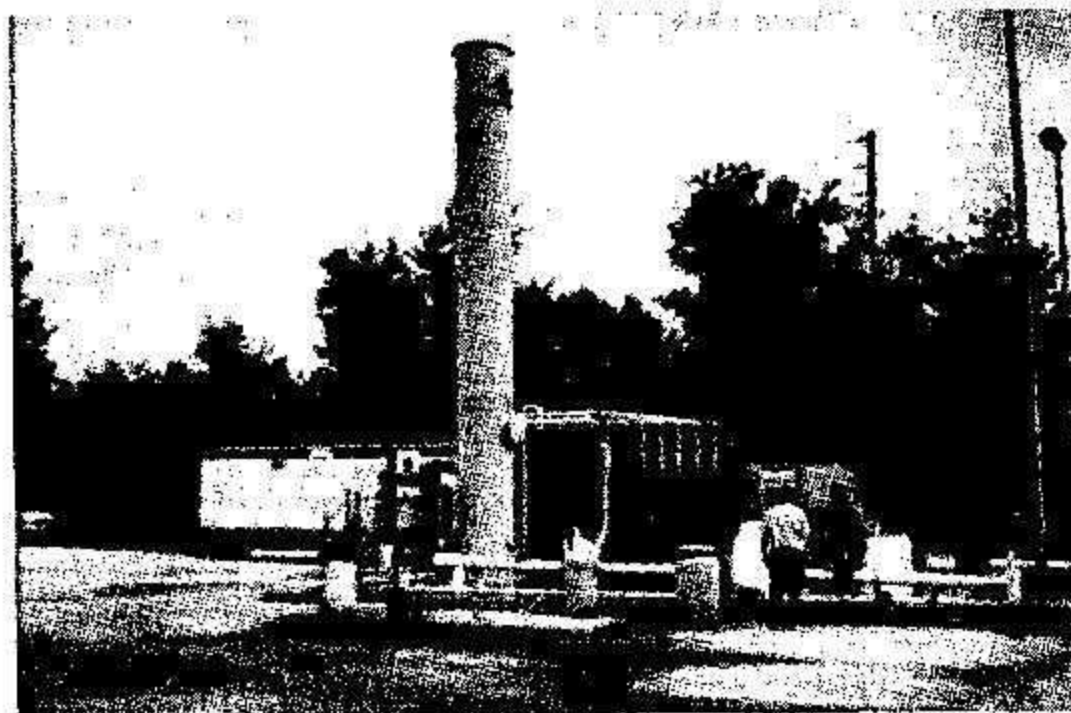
View of Treatment Facility, Concrete Pad, On-Site Trailer
